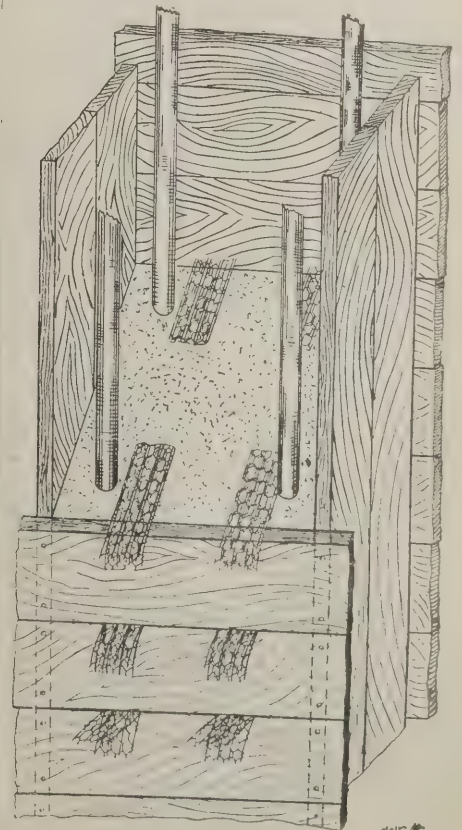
BONDING FIN PLACED IN A REINFORCED CONCRETE COLUMN.
